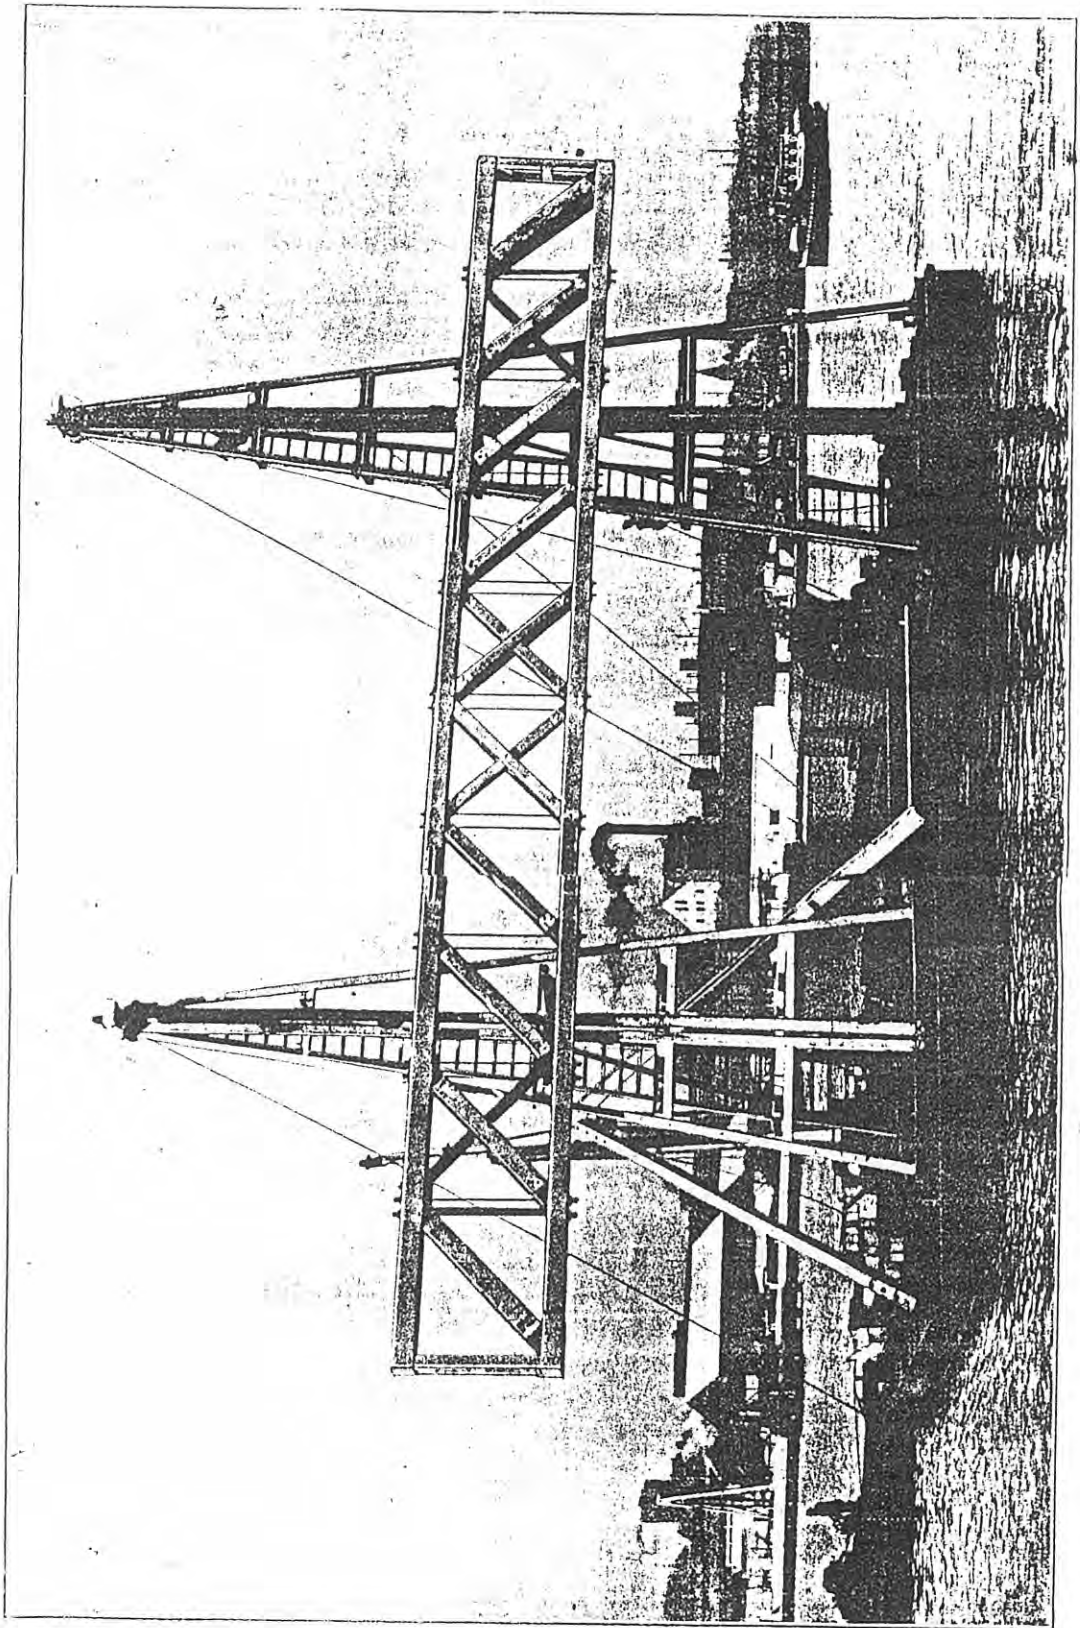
TOWING THE FIRST THREE SIDE SPAN TRUSS TO BRIDGE SITE
